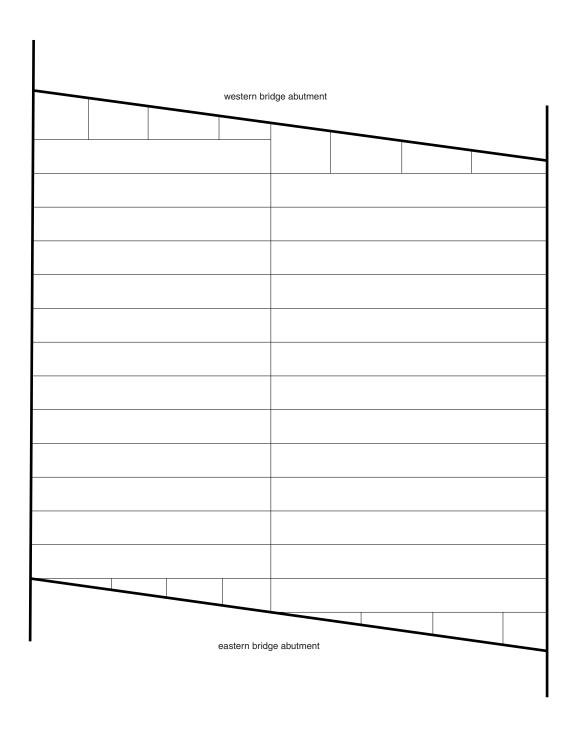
Schematic plan of the underside of the bridge deck, White Post Lane, showing the arrangement of wrought iron girders
